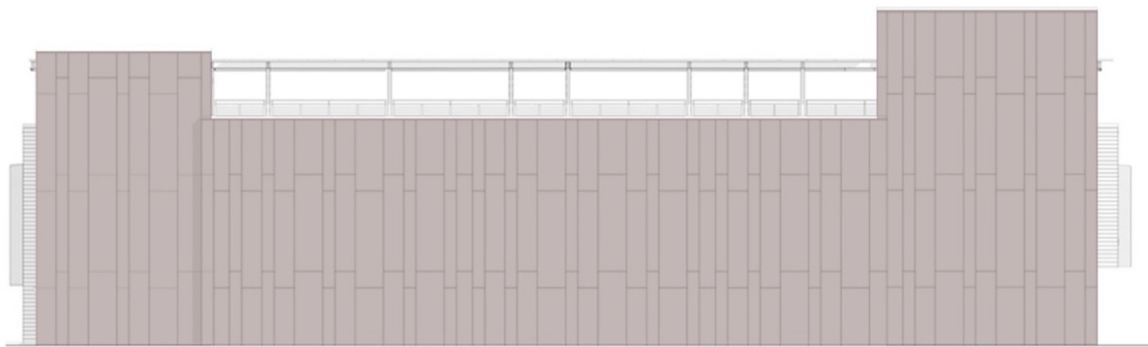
North Elevation. Reference: ArchDaily, edited by Author.
